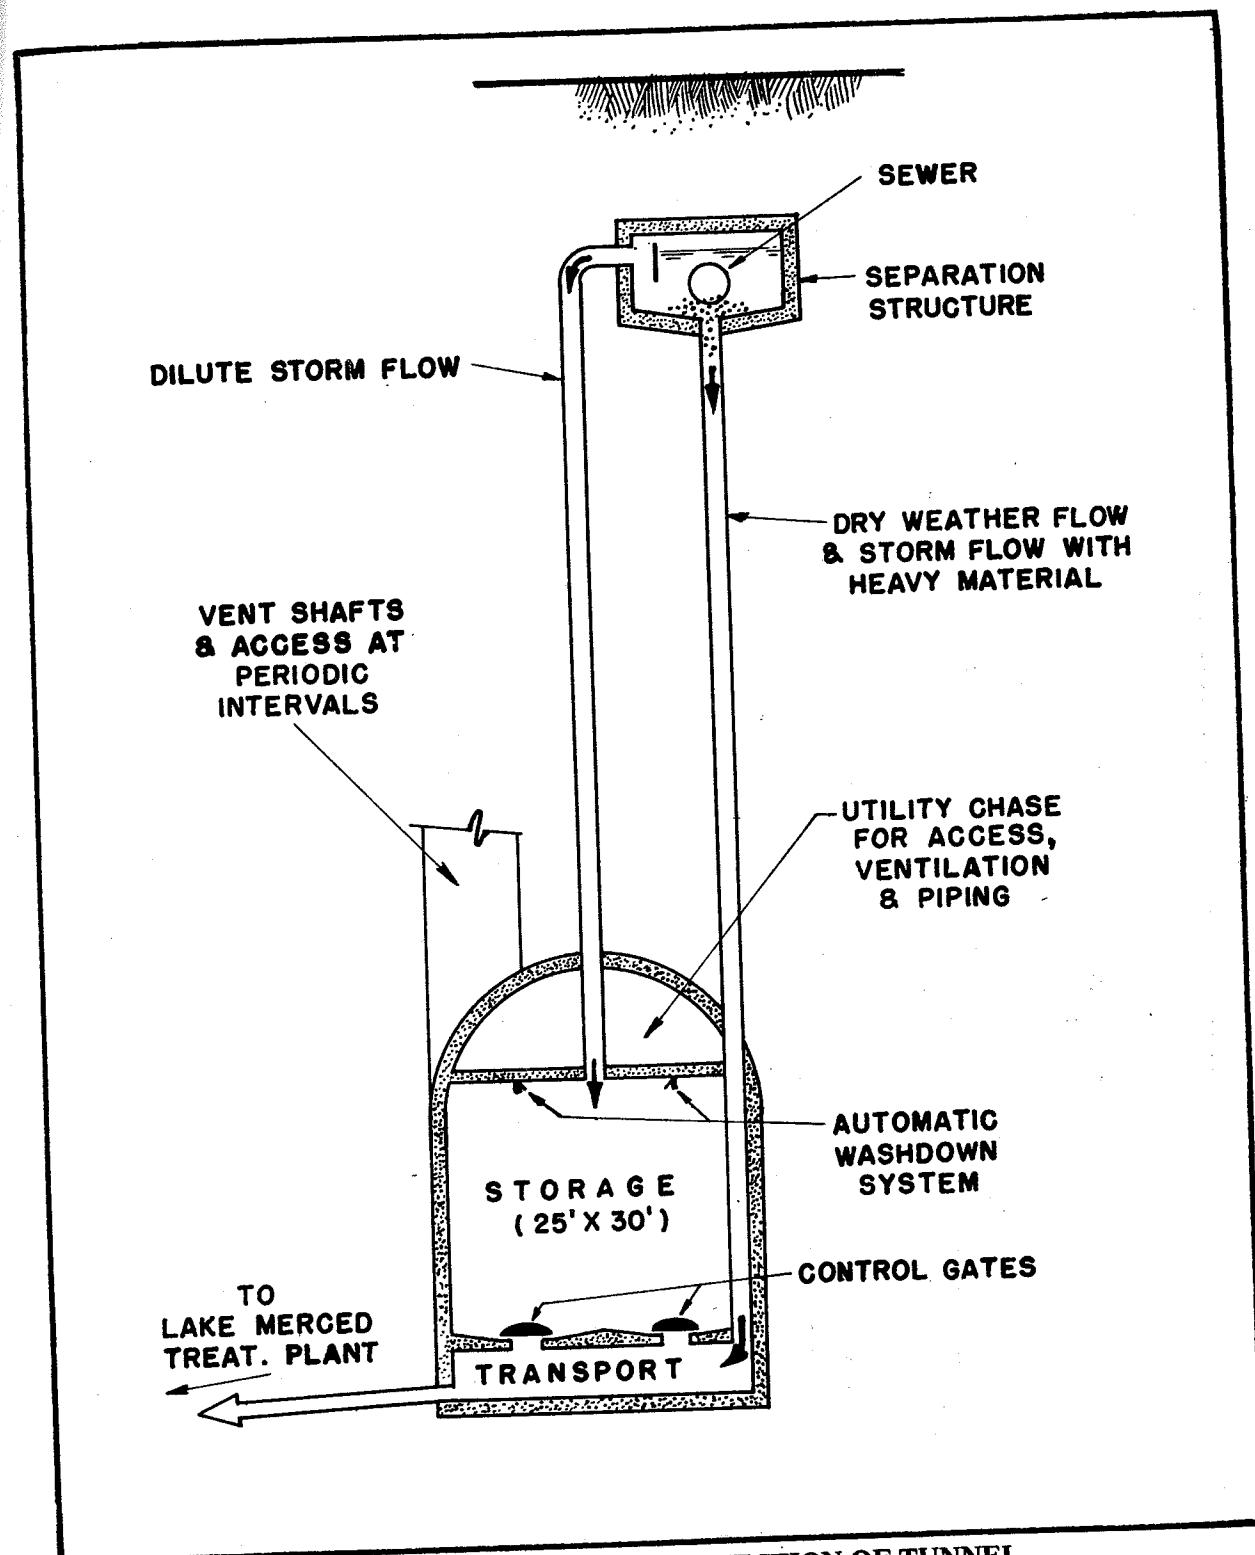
SCHEMATIC SECTION OF TUNNEL
